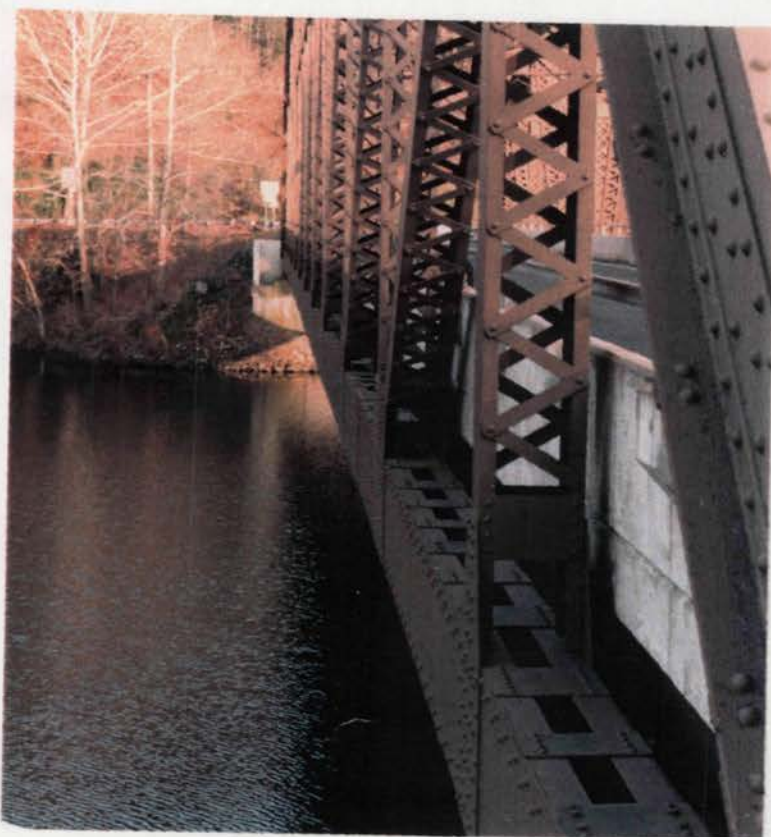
Downstream edge of Glen Road Bridge over Lake Zoar (MP 27.3).
